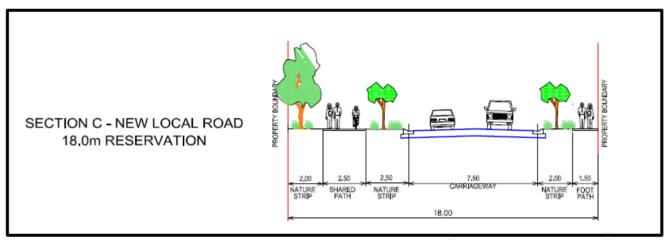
Cross-section for 18m wide public access road (Source: Traffix Group)
